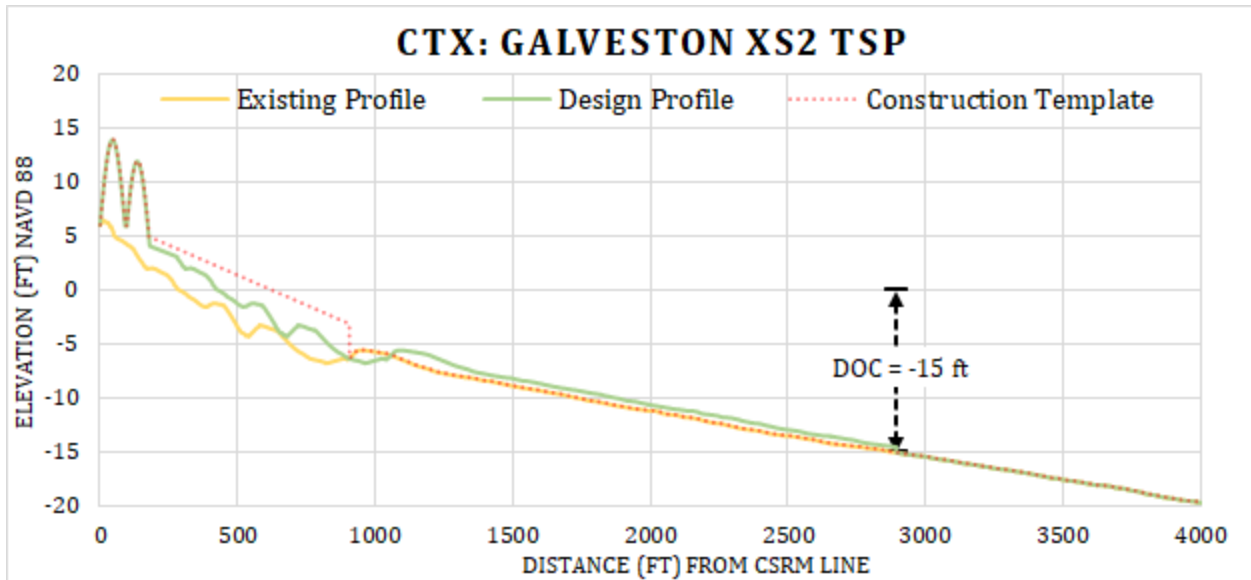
Galveston XS2 TSP; Construction template volume = 11.9 cyd/ft, top elev. at +5', slope at 1:90
